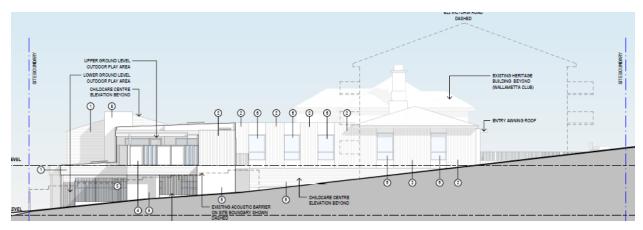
South-eastern (side) elevation facing 820 Victoria Road (note 822 Victoria Road shown hashed outline).
